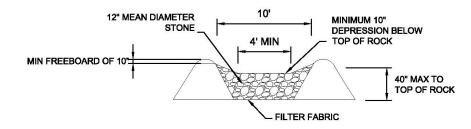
Schematics of Excavated Stone Outlet Sediment Trap
